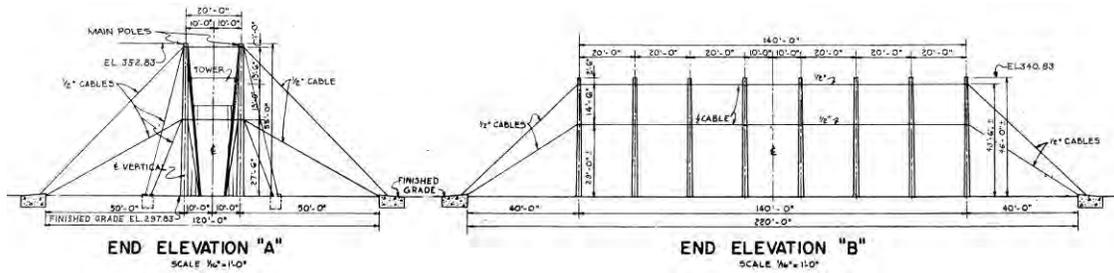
Mock-up tower for airborne training, elevations, Fort Bragg, NC, 1952 (standard drawing 28-13-59 sheet 1 of 6; mock-up tower for airborne training, layout plan and elevations; 11 April 1952).
